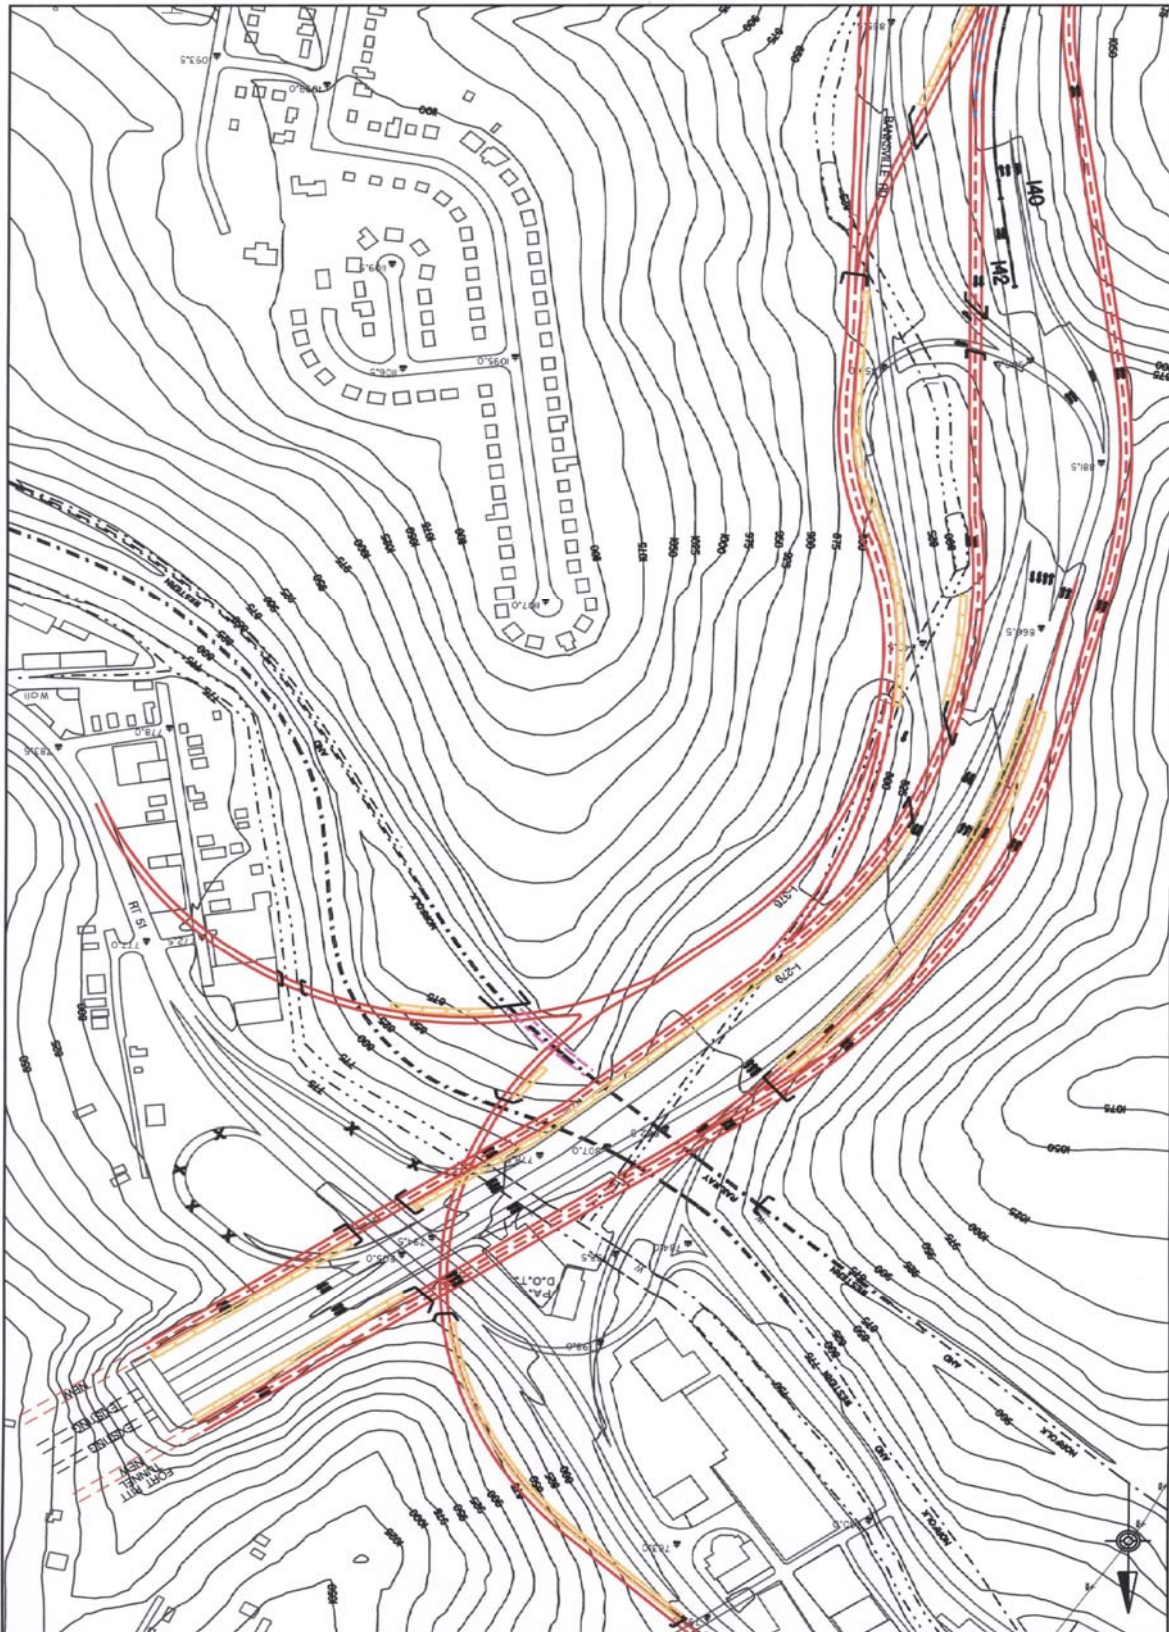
Plan View of South End of Fort Pitt Tunnels - Outbound
